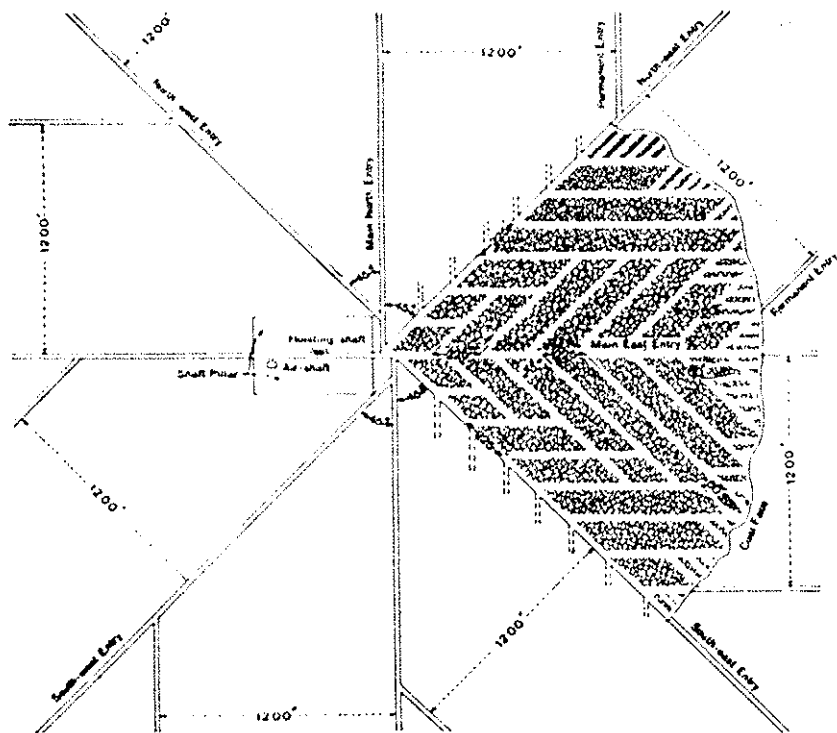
Plan of longwall mine with auxiliary permanent entries
